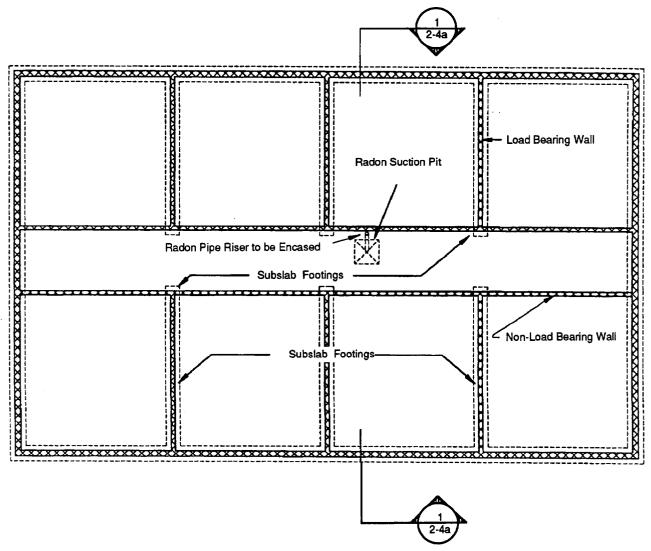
Interior walls between rooms and outside walls load bearing. Not to scale.
